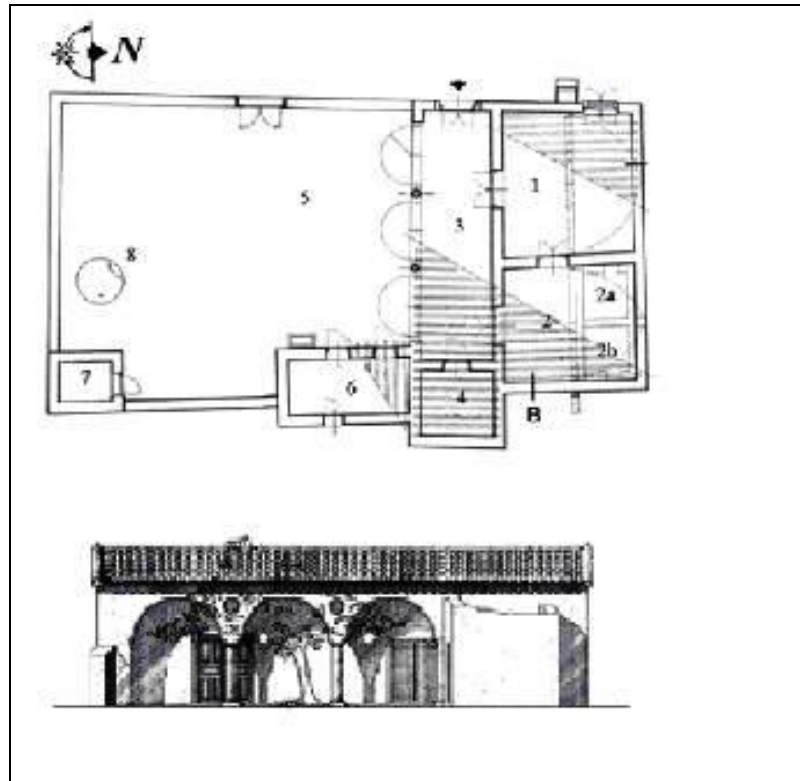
Cypriot courtyard house. Plan and Section through the courtyard, showing South Elevation. 1-Bedroom 2-Storage 3-Porch 4-Kitchen 5-Courtyard 6-Animal Den 7-Toilet 8-Oven (Günçe et al. 2008:826) Original drawings by Eryaşar and Turgay (2005:111) in *Twelve Traditional Cyprus Houses*, Nicosia:Kailas.
